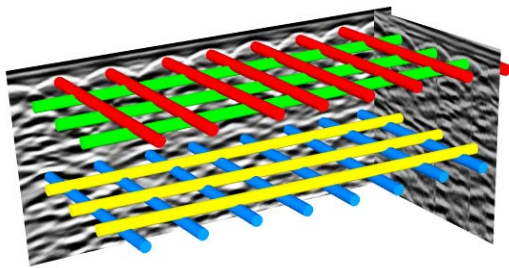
Three-dimensional visualization of reinforcement in ground floor structure
